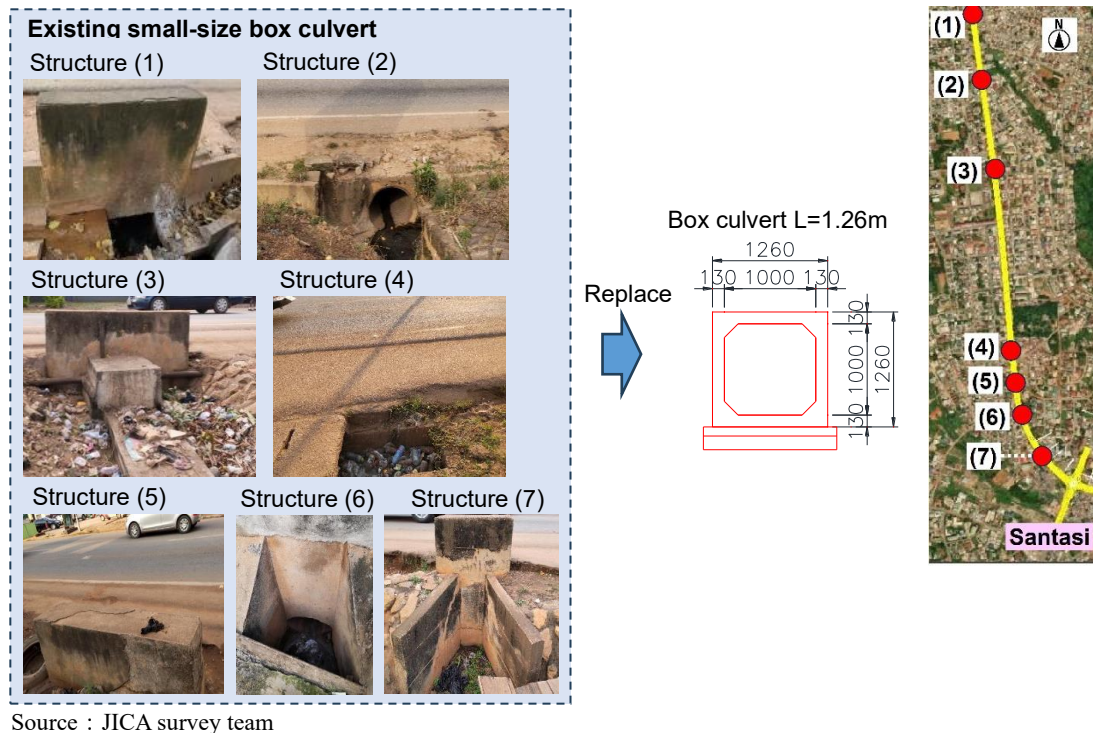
Structure (1)~(7): Box Culverts $L=1.26\text{m}$
